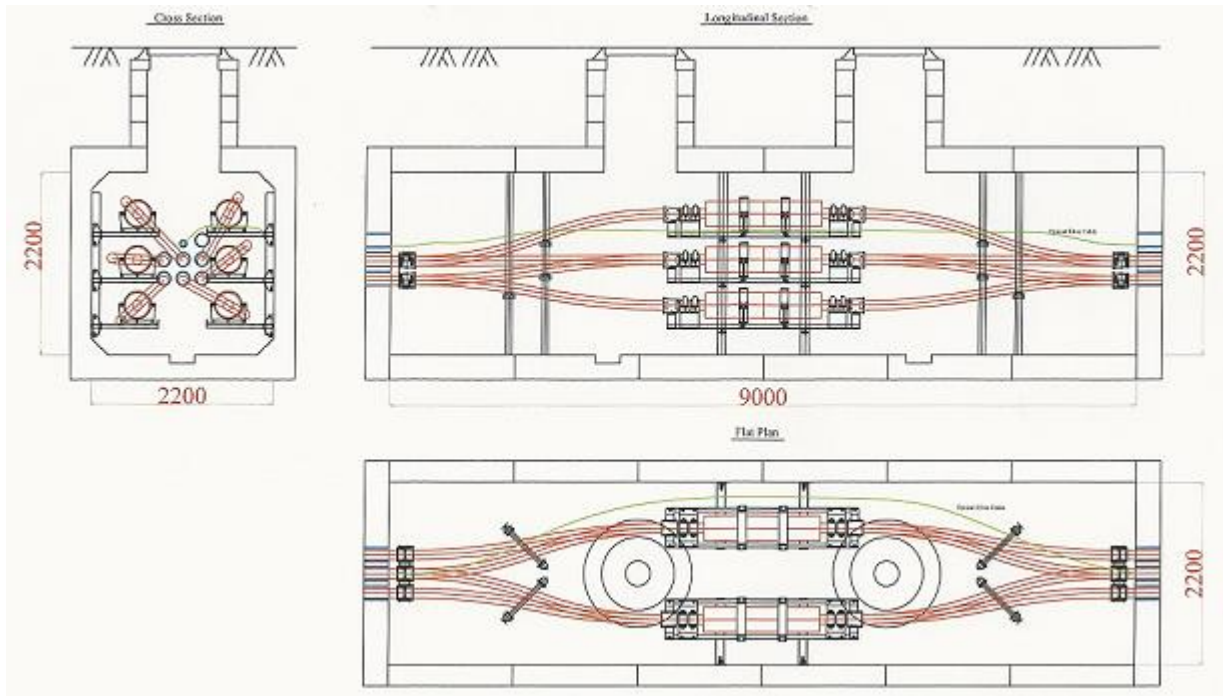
Example of cable and joint box arrangement in manhole
